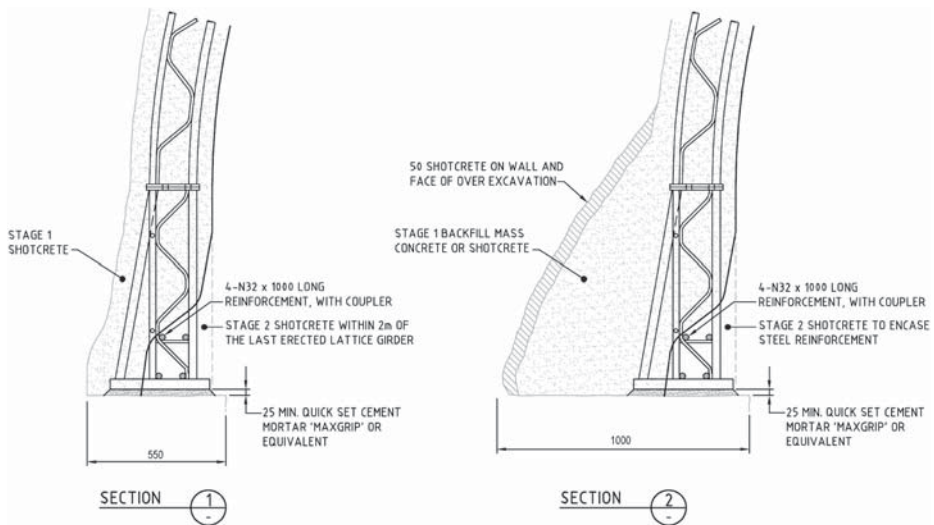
The standard shotcrete and alternative wider footing/wall beam for highly weathered claystone.
